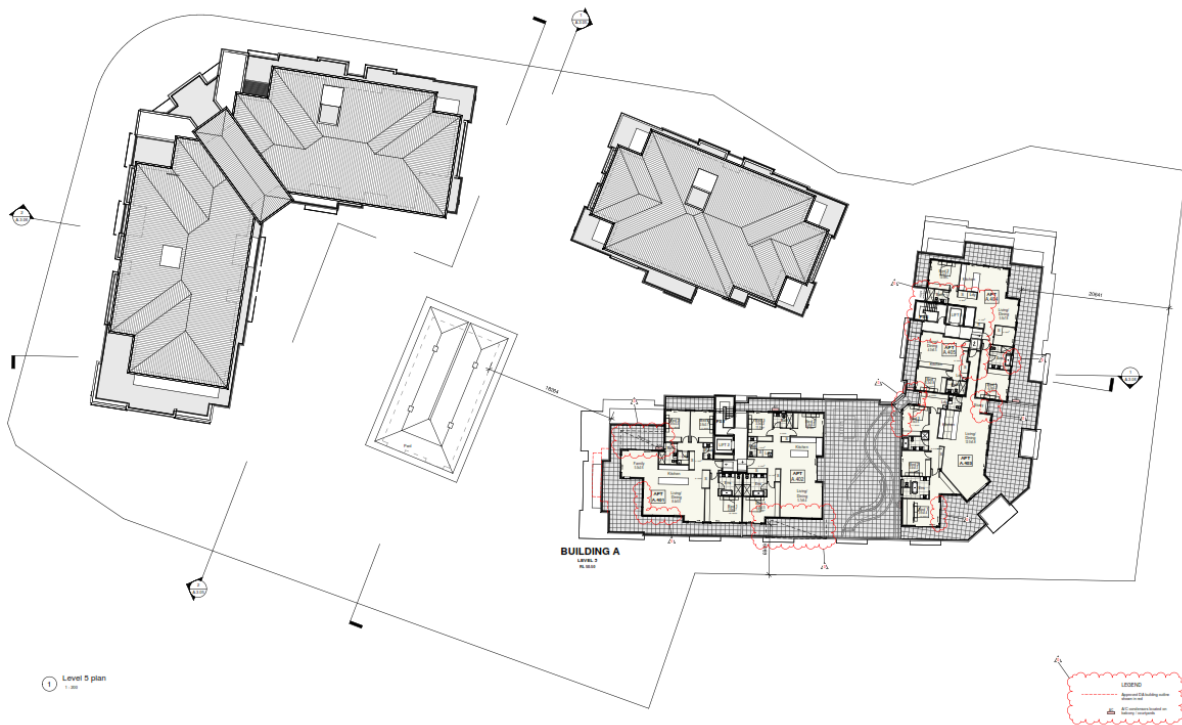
Pacific Lodge & Level 5 Floor Plan (Dwg No. A 2.07)
